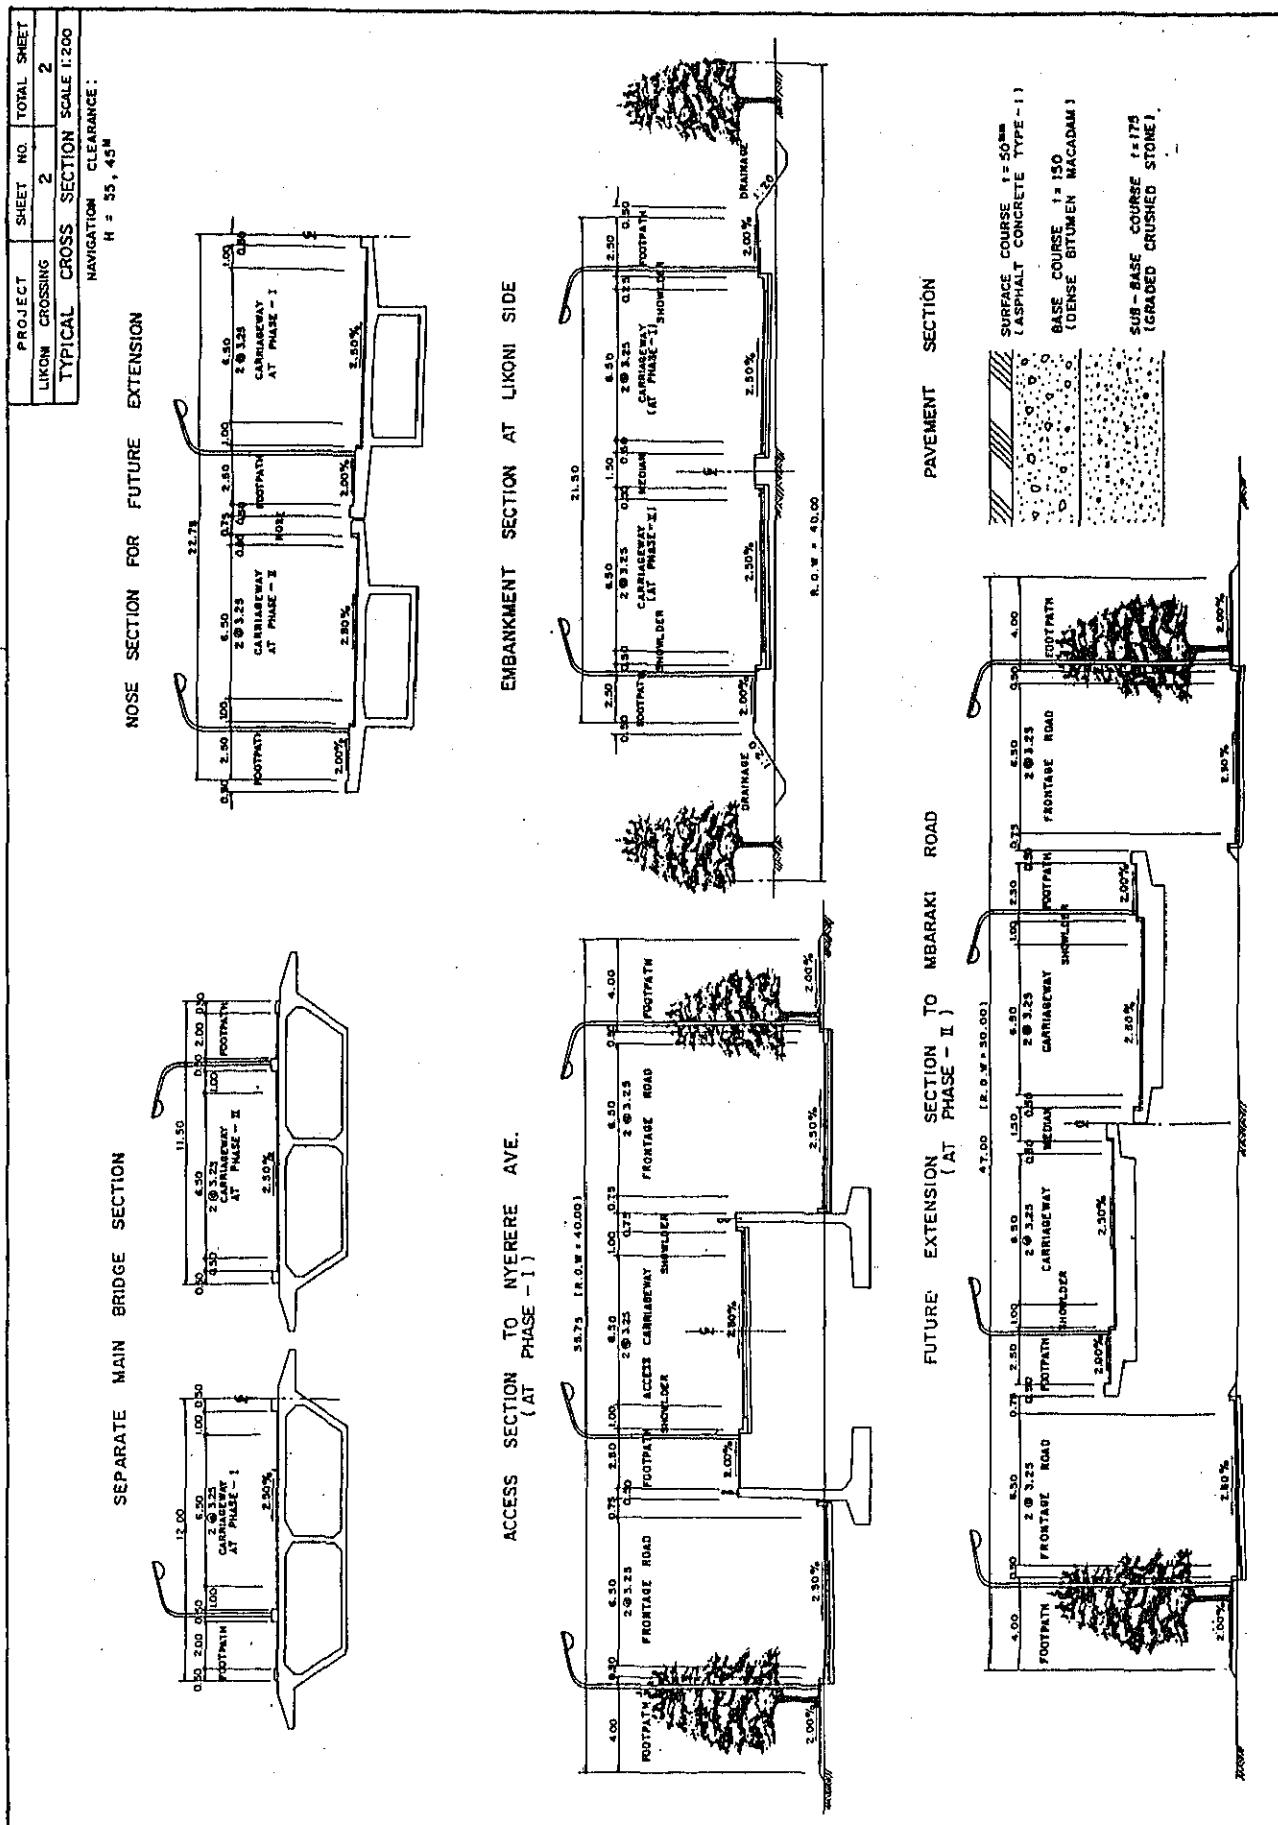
TYPICAL CROSS SECTION (H = 55 AND 45 M)
